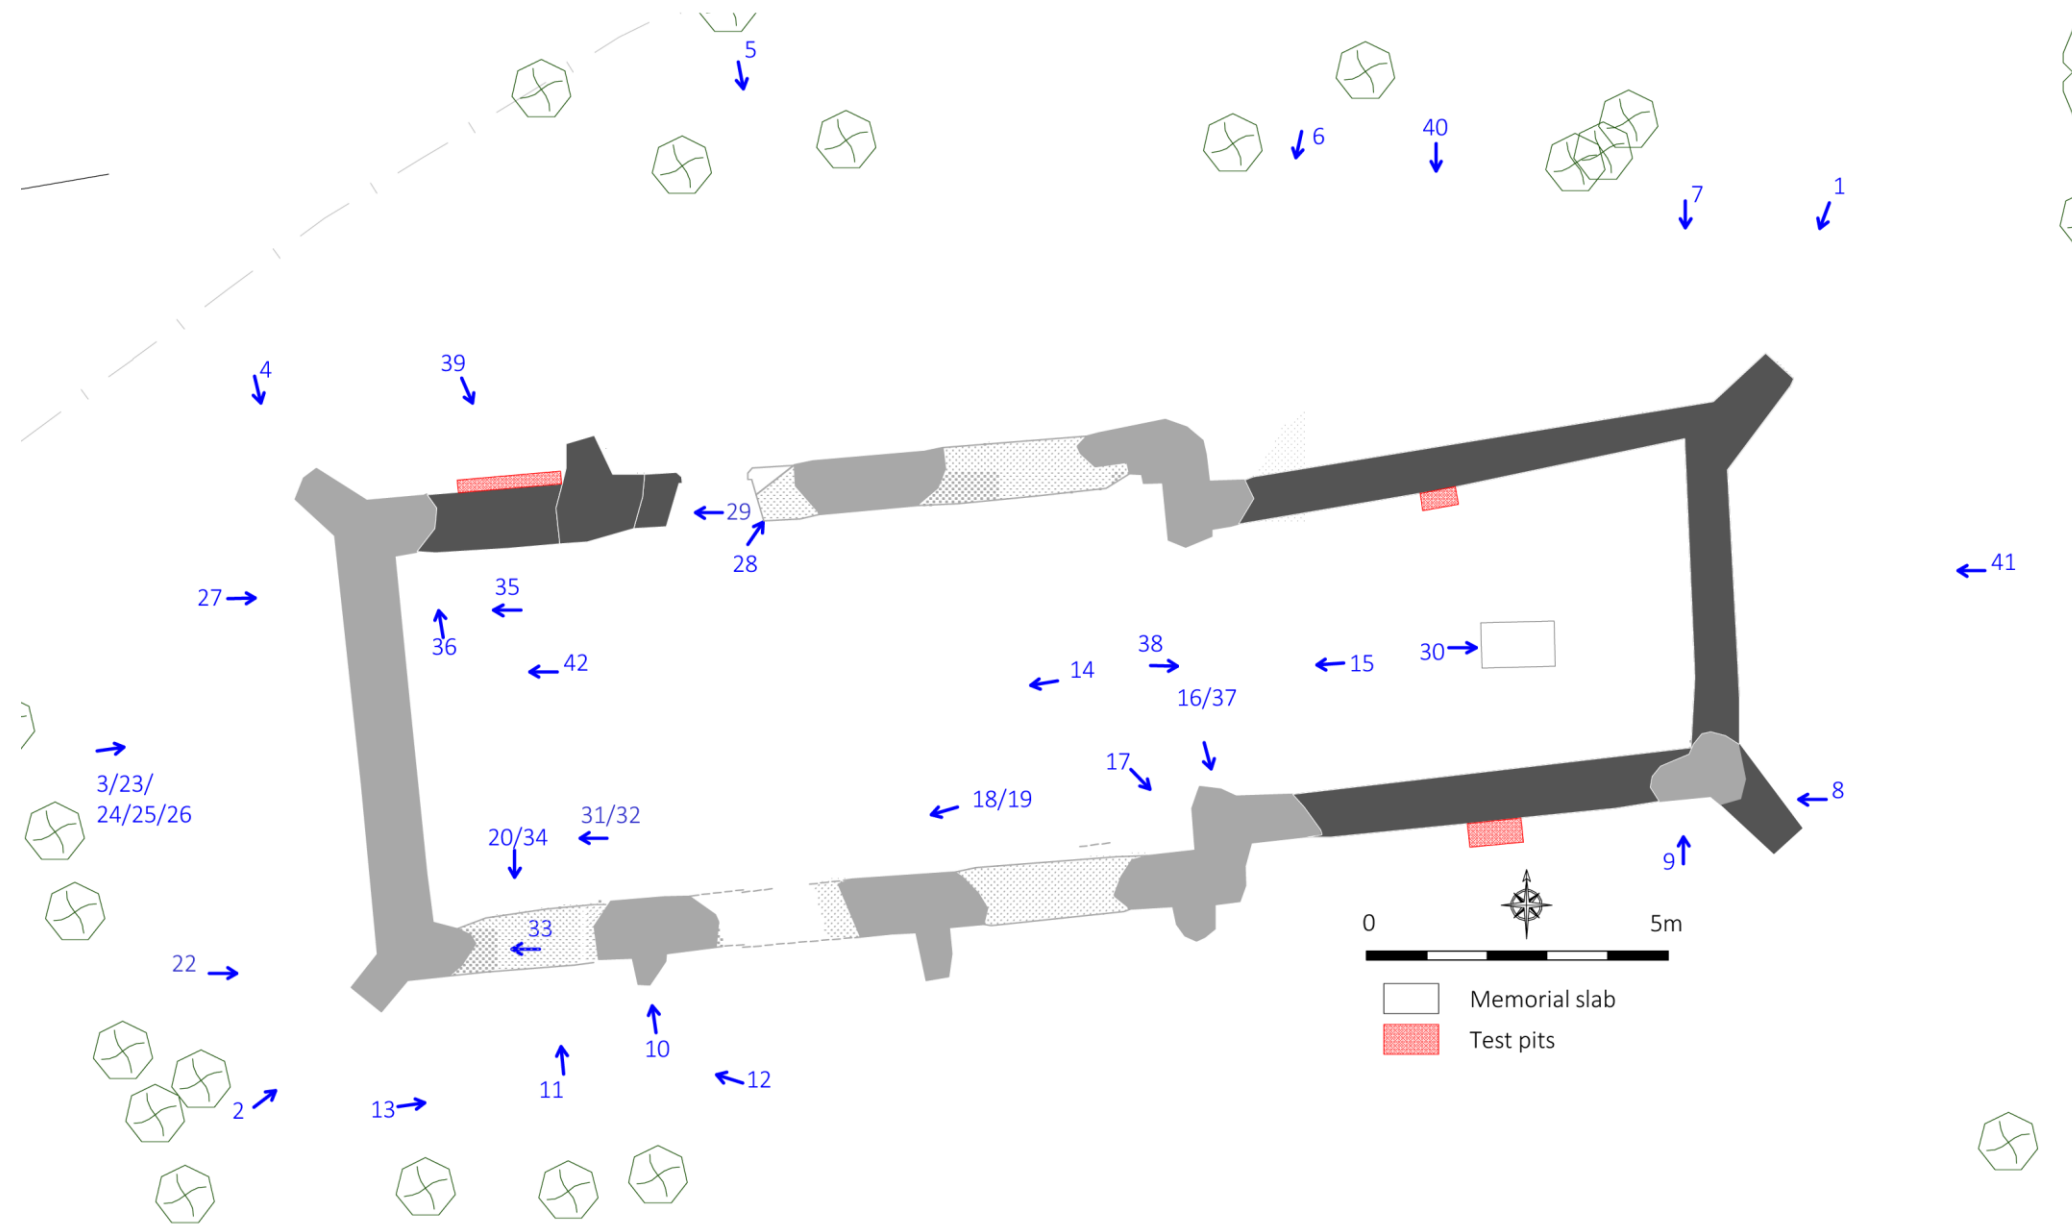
Photo plan 10<sup>th</sup> October 2022 (scale 1:125)
